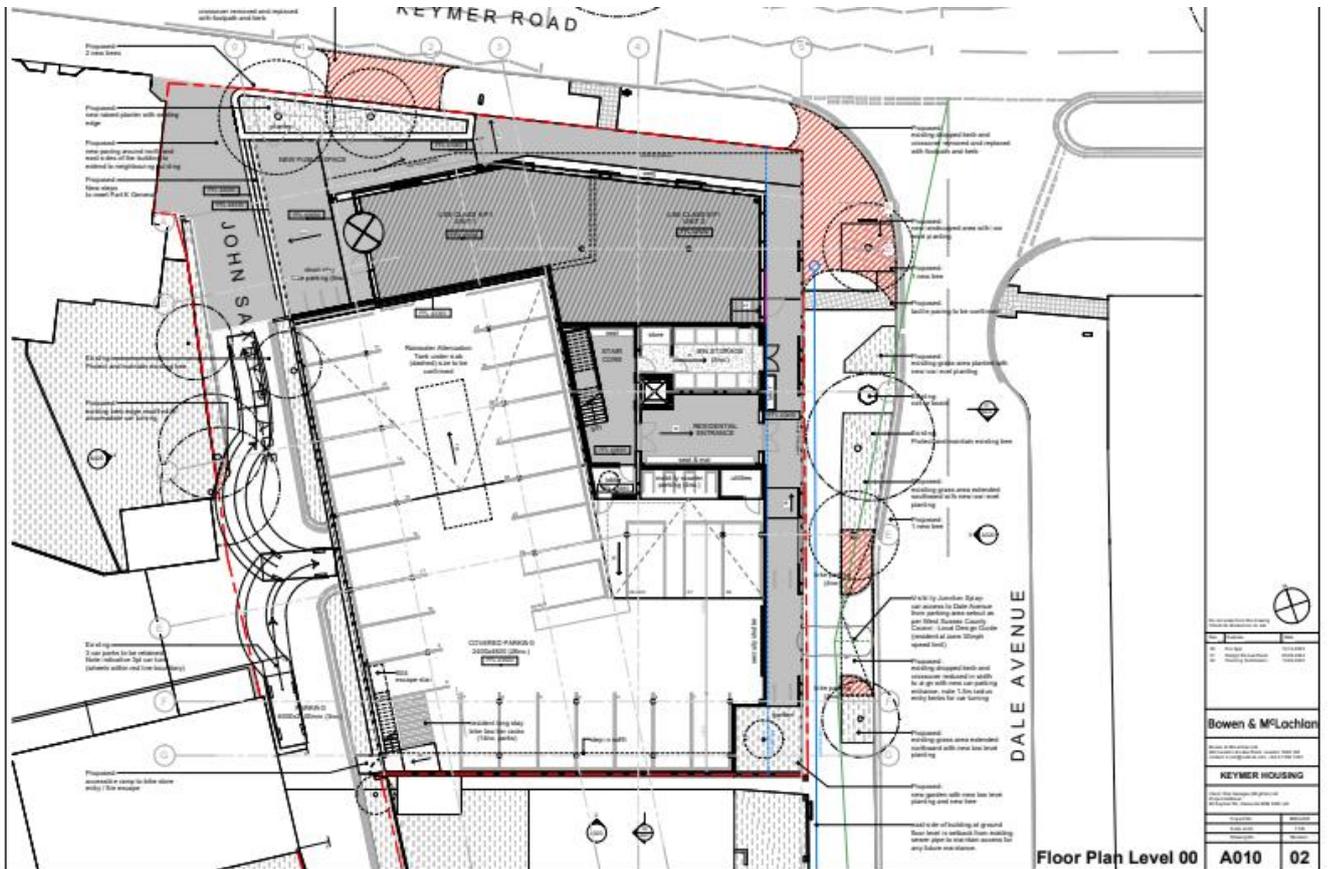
Proposed Site plan © Bowen and Mc.Lachlan Ltd drawing number A010 revision 02.
